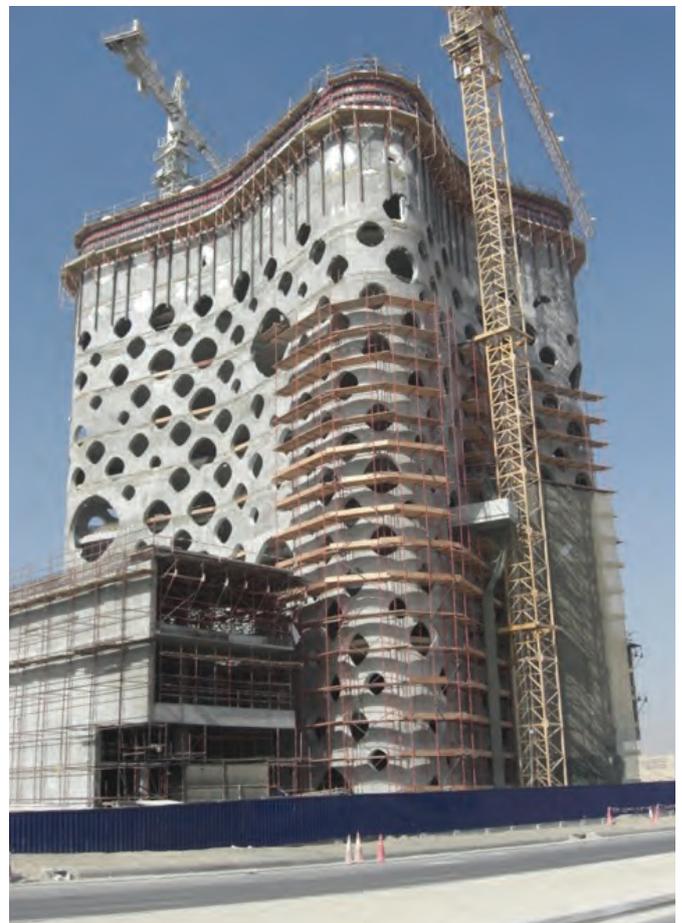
, "O-14", office tower in Dubai, external reinforced concrete structure, construction, Reiser & Umemoto
